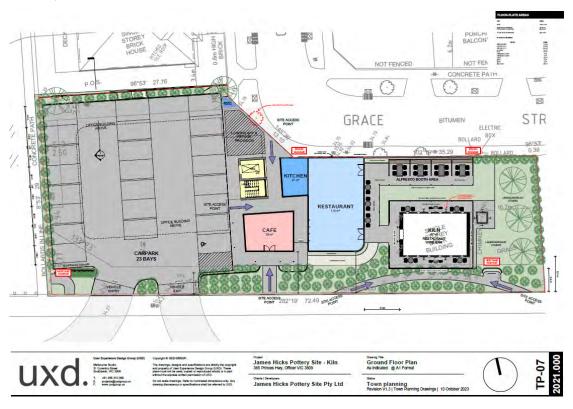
Concept plan for proposed James Hicks Pottery site development (David Morgan)
